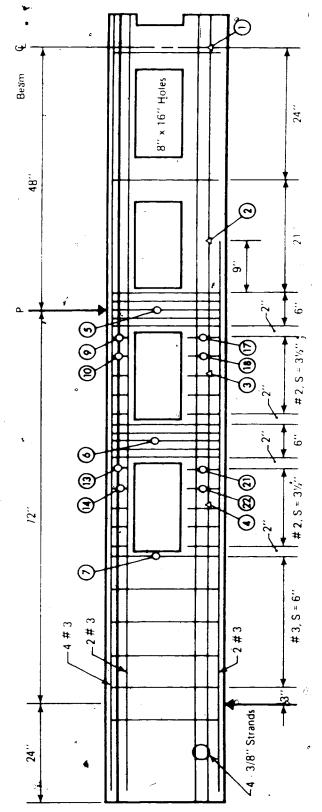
Reinforcement Details and Strain Gage Locations for Beam 6-16-6
